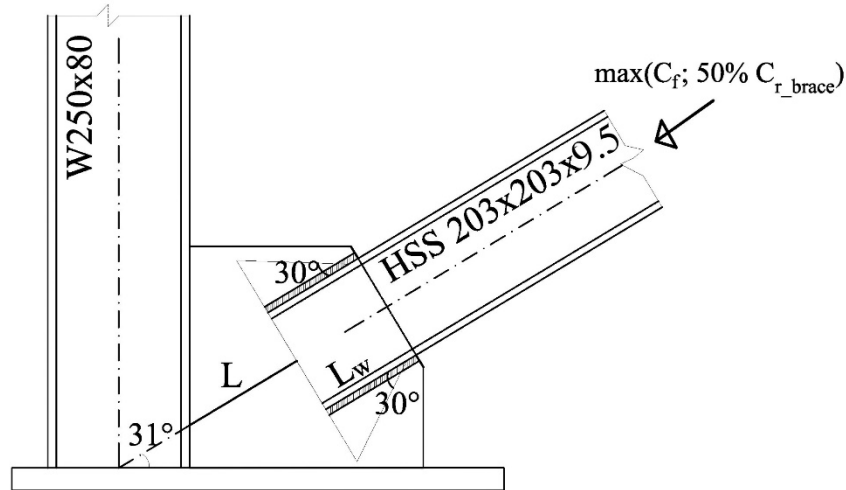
Corner connection detail at ground floor in N-S direction (pre-retrofit connection of 3-storey CBF, Quebec City)
